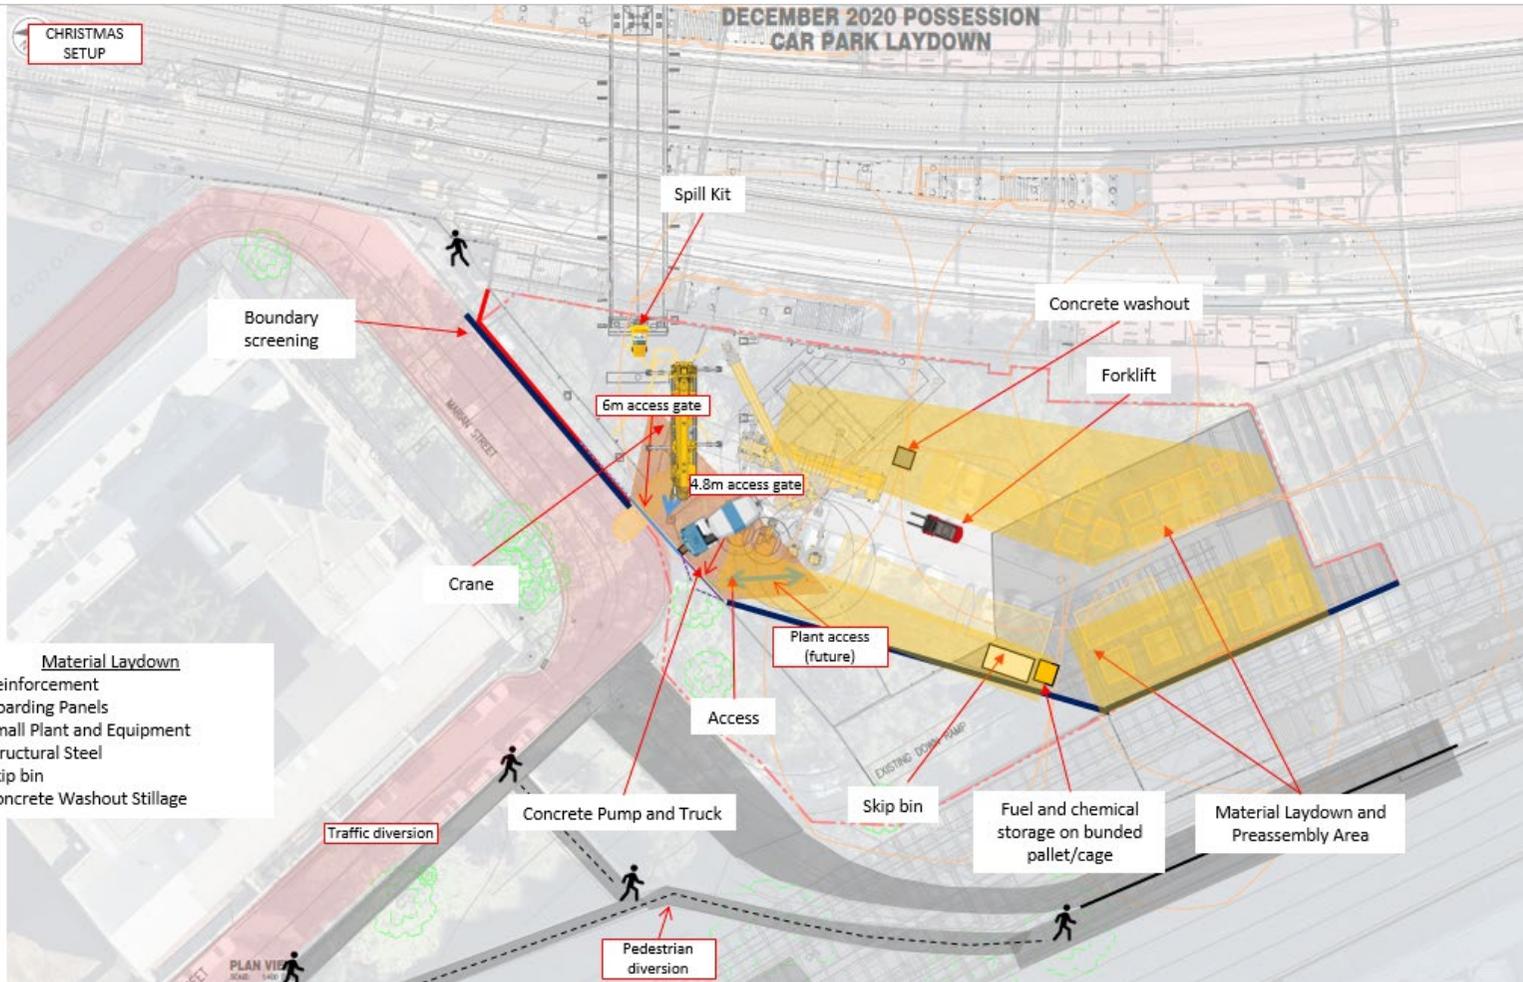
Gibbons Street Reserve and Marian Street carpark ancillary site layout – Marian Street car park
